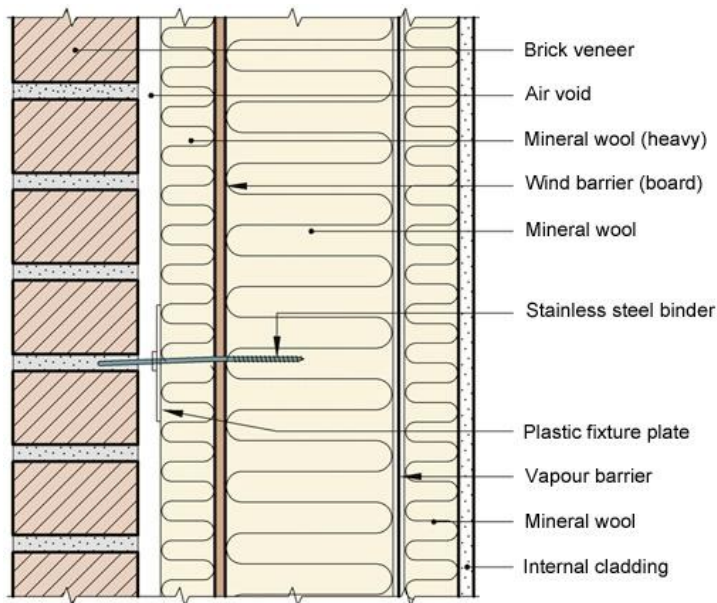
Brick veneer on a framework wall (Kvande 2009).
